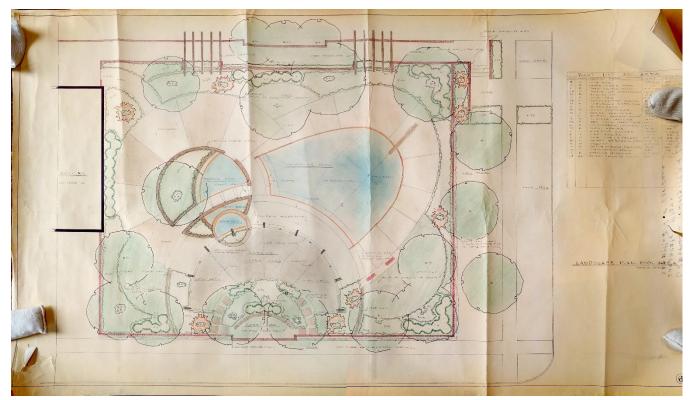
Original plan drawing of the Cambridge Tower pool area from the 1964 construction drawing set. Source: Austin History Center, Architecture Collection.
